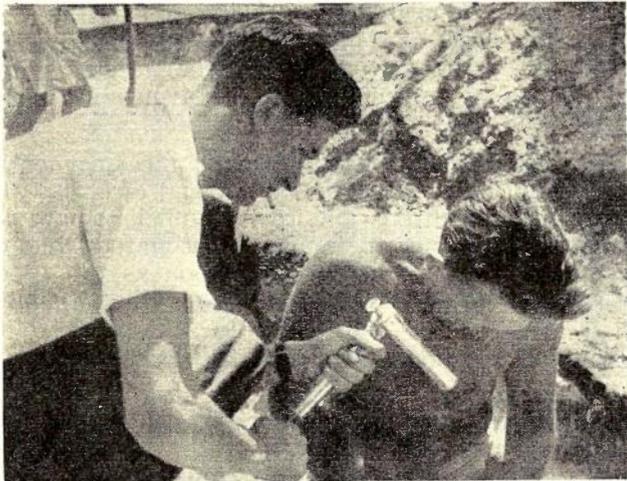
Dust sample being taken at manhole excavation, Bickle Road, Mosman, N.S.W.
